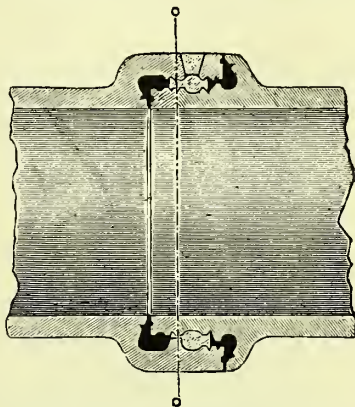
Ames and Crosta's Double Seal Pipe-joint.
